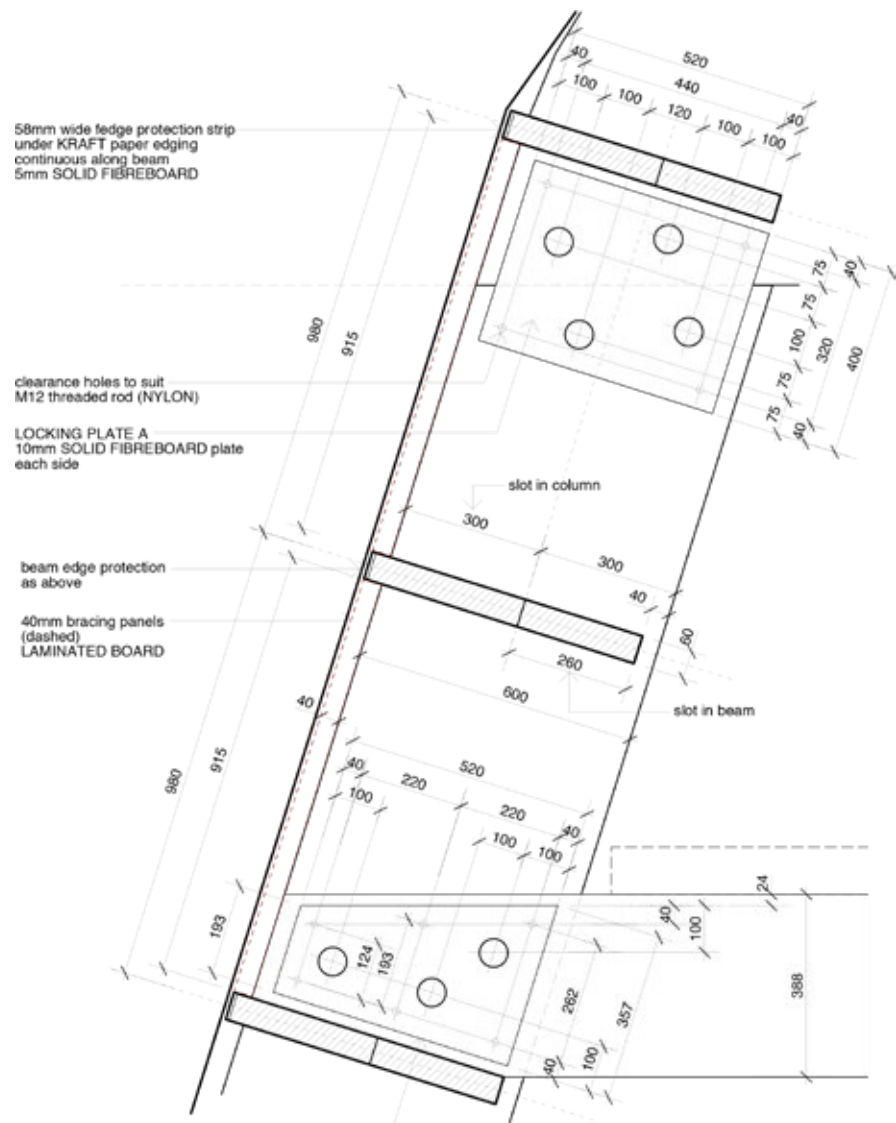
Cardboard House – detail of the connection between the A-frame and the horizontal spacers, 2004
